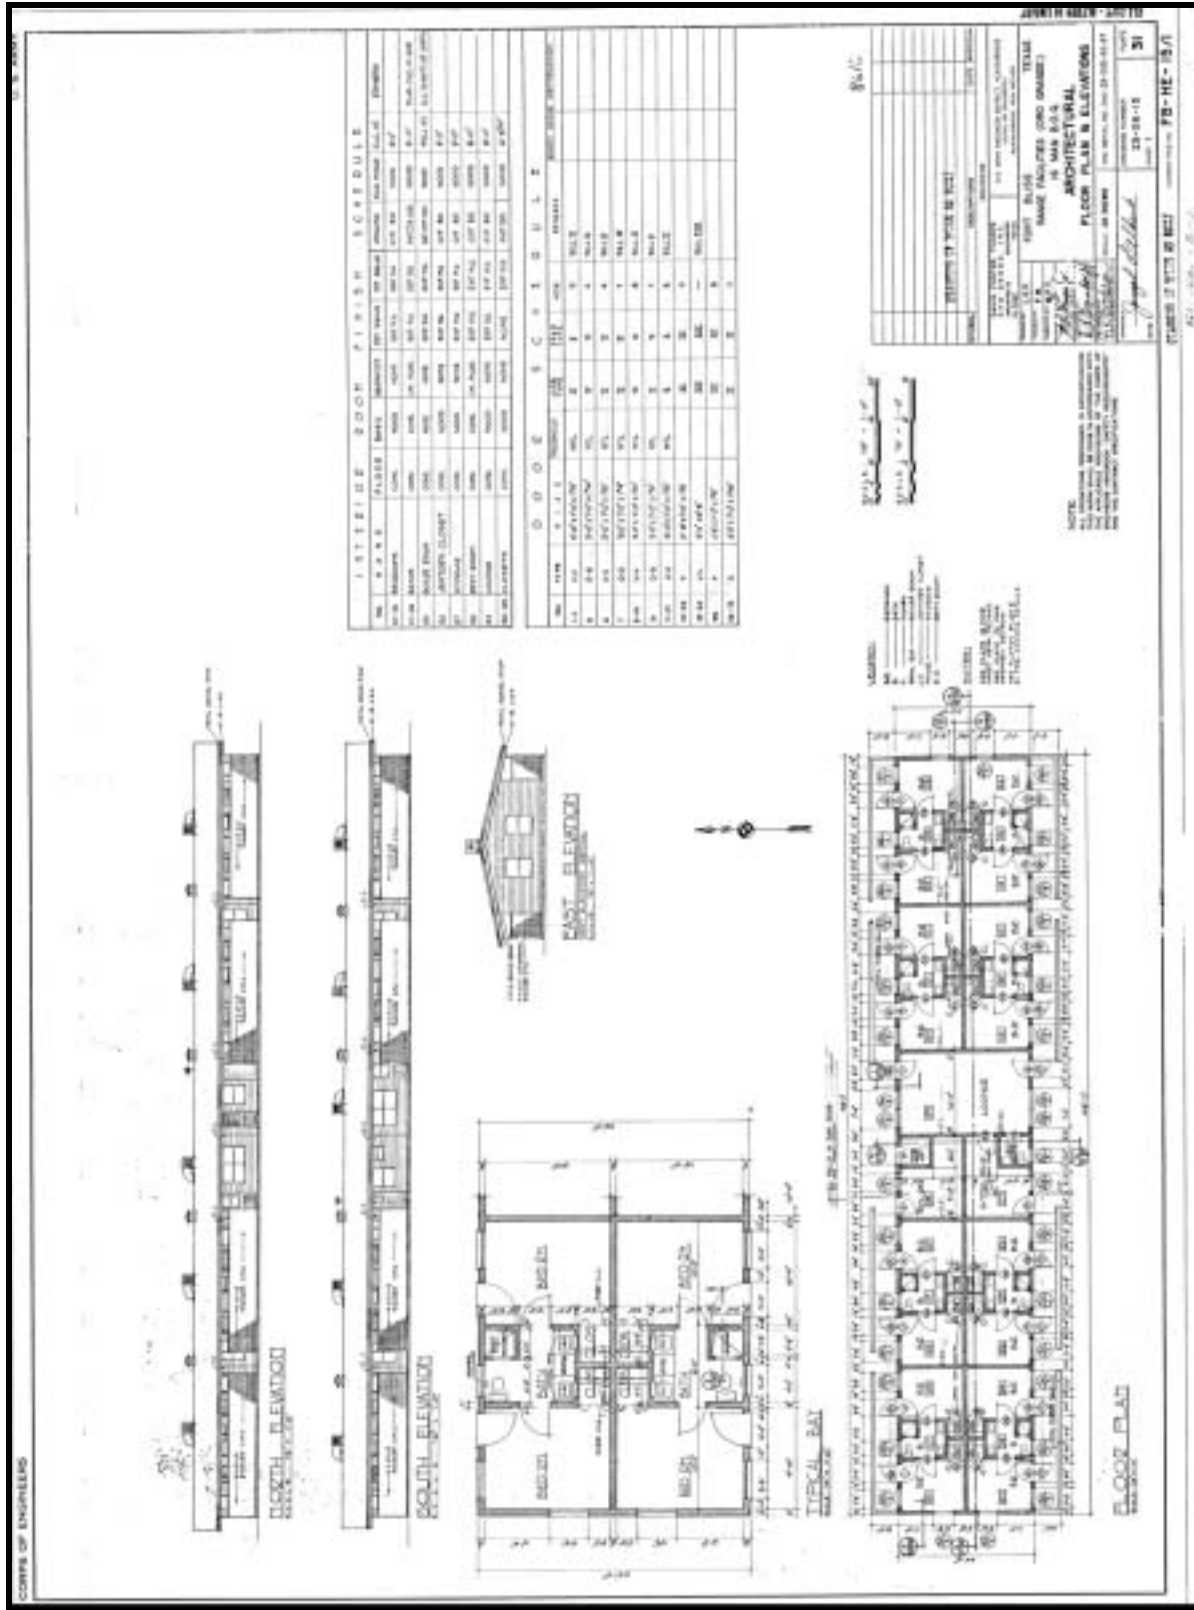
Semi-permanent 16-man BOQ, floor plan and elevations, Oro Grande Range, Ft. Bliss (ca. 1960) (Engineering, Ft. Bliss).
